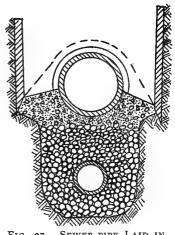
SEWER-PIPE LAID IN CONCRETE.
